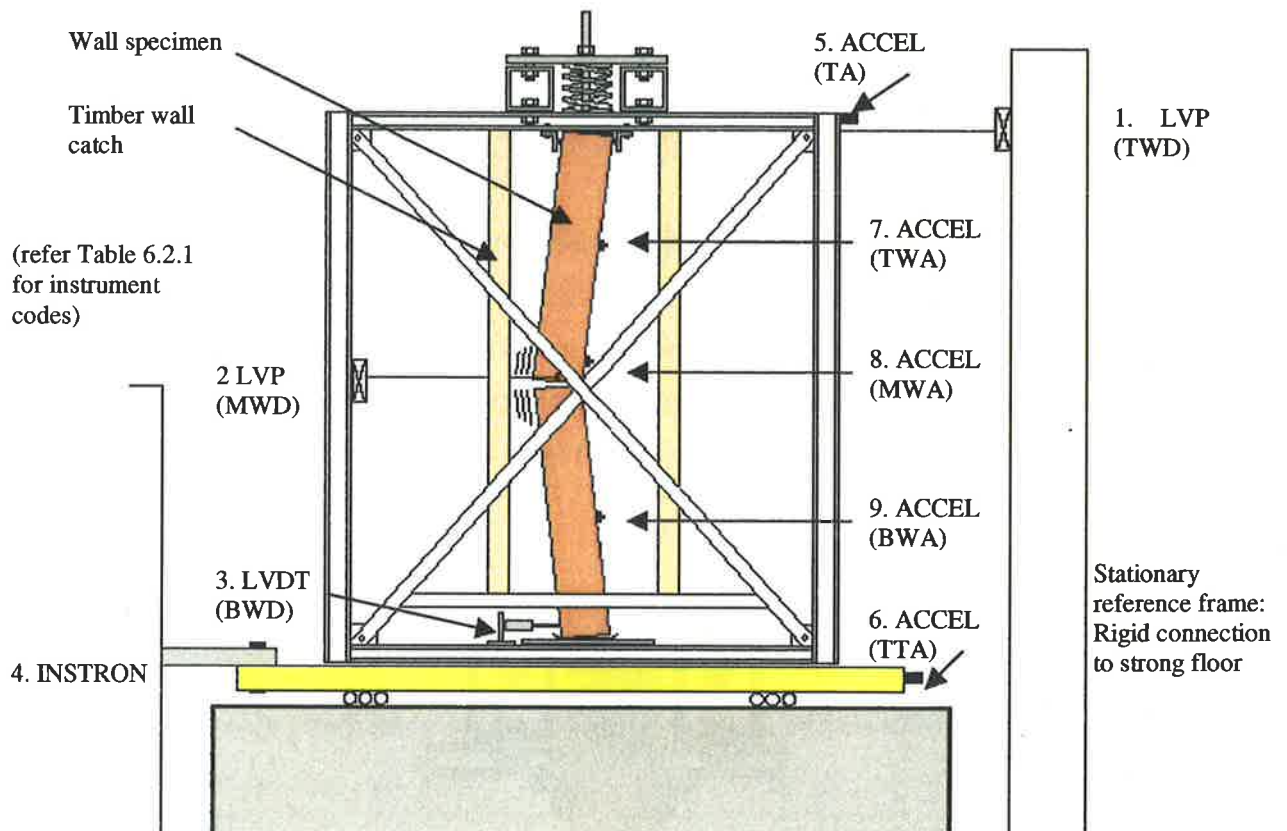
Out-of-plane Wall Test Instrumentation Locations
